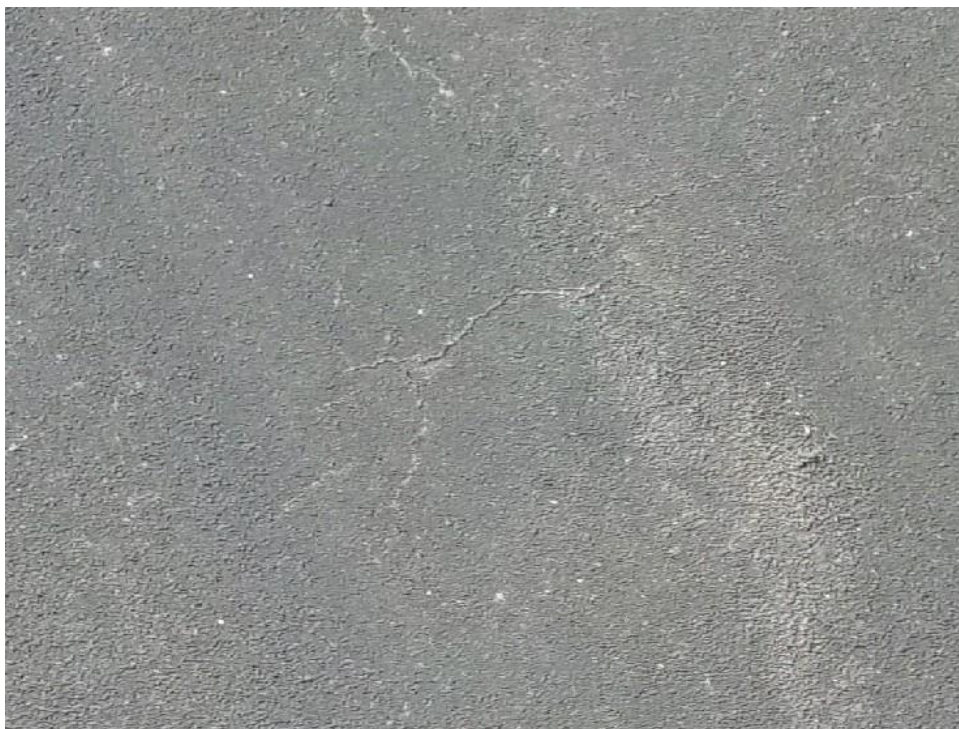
Typical Longitudinal Cracking (medium-severity)
